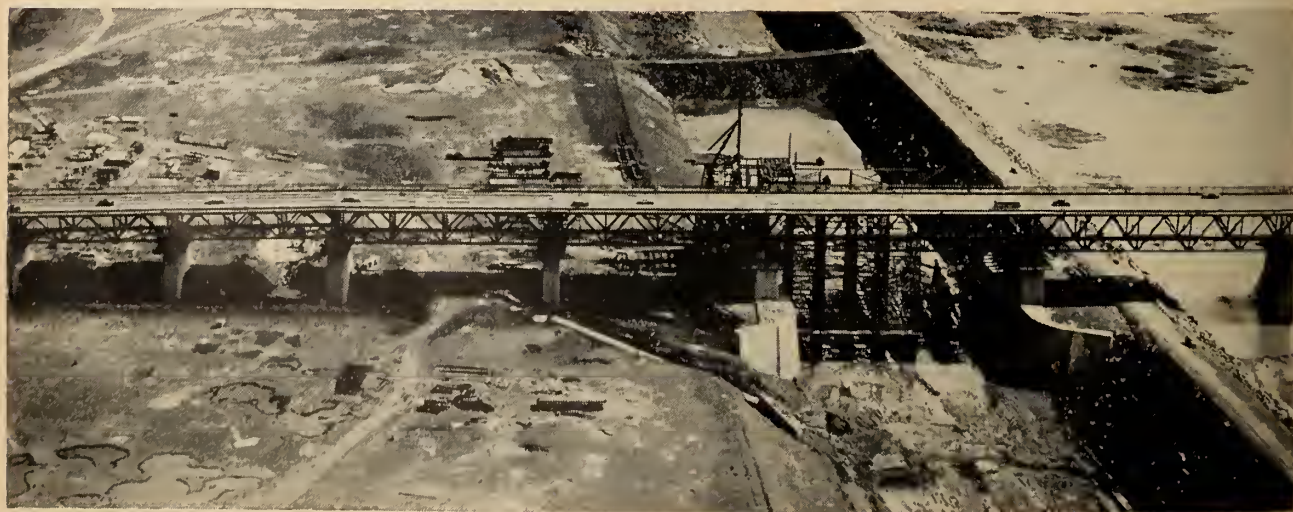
Victoria Bridge, showing span No. 25 in way of St. Lambert Lock under construction.
